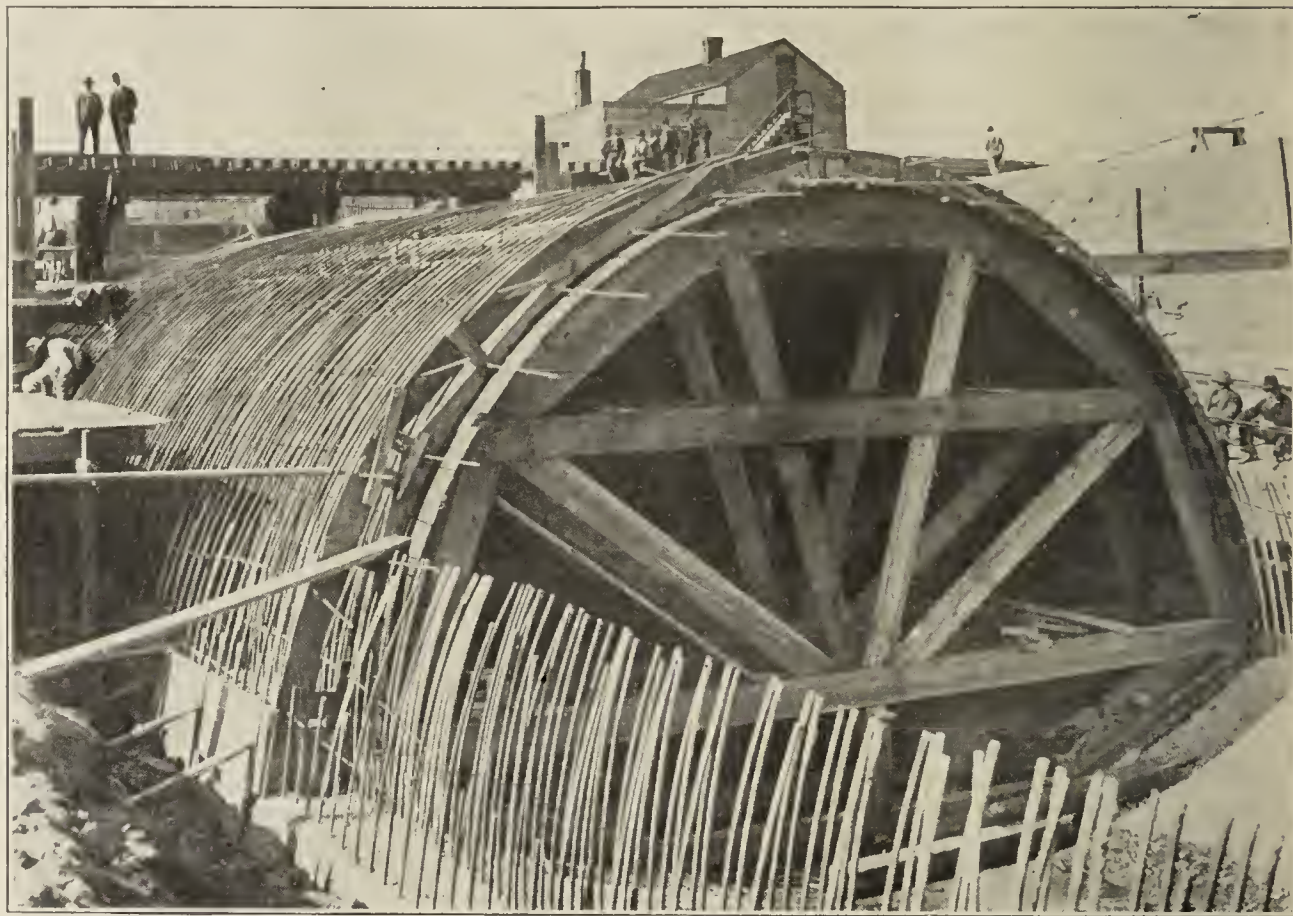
Centering and Reinforcement, Harlem Creek Sewer.
